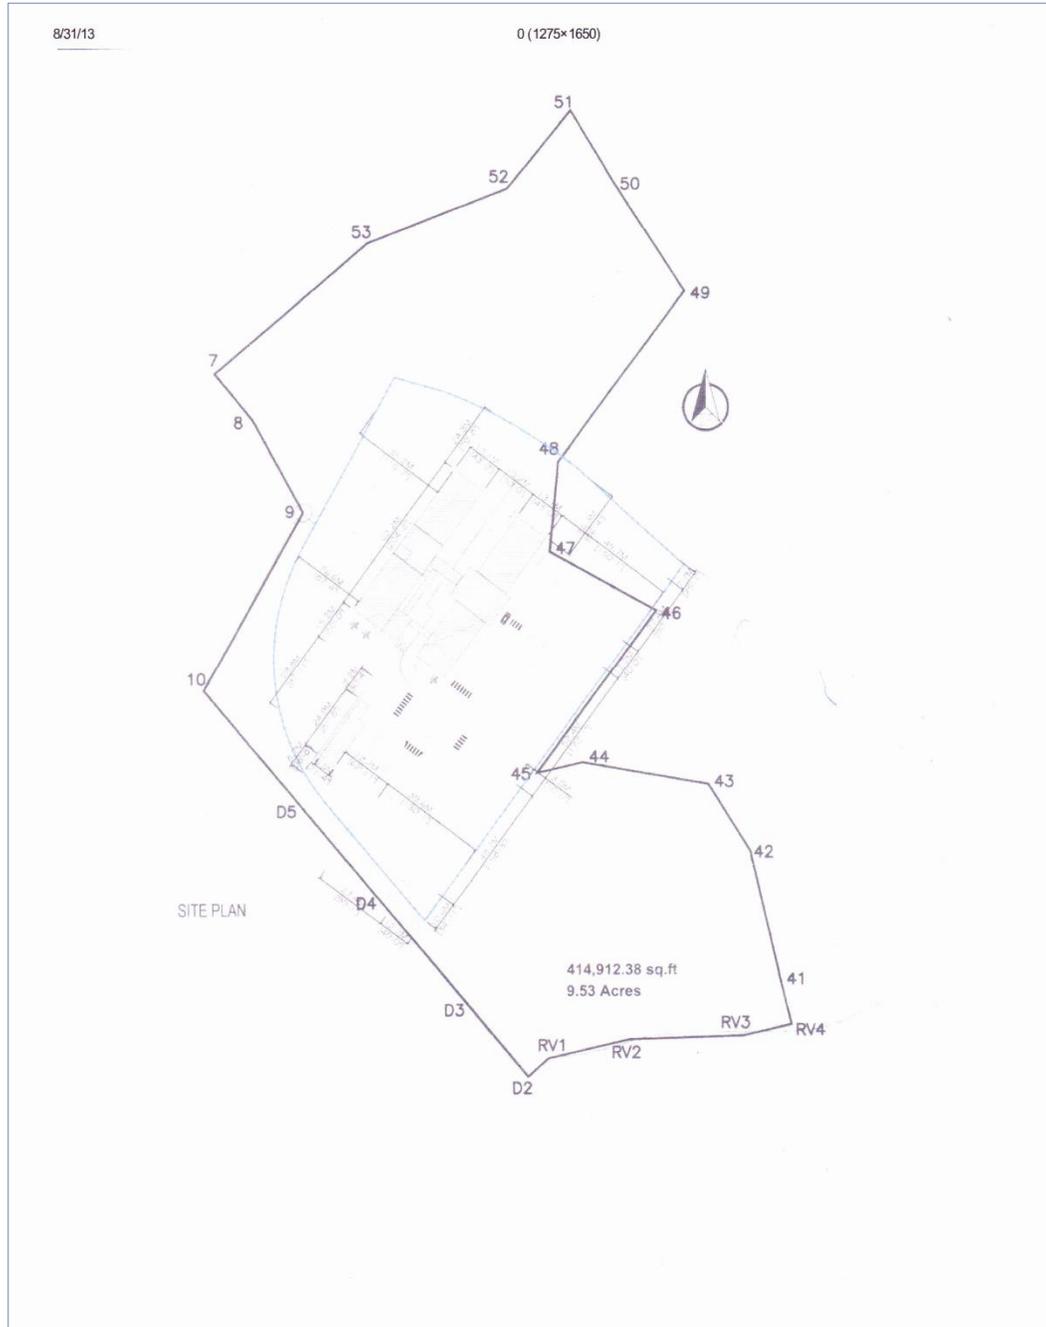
Original Site and Location Plan for Dennery Polyclinic
